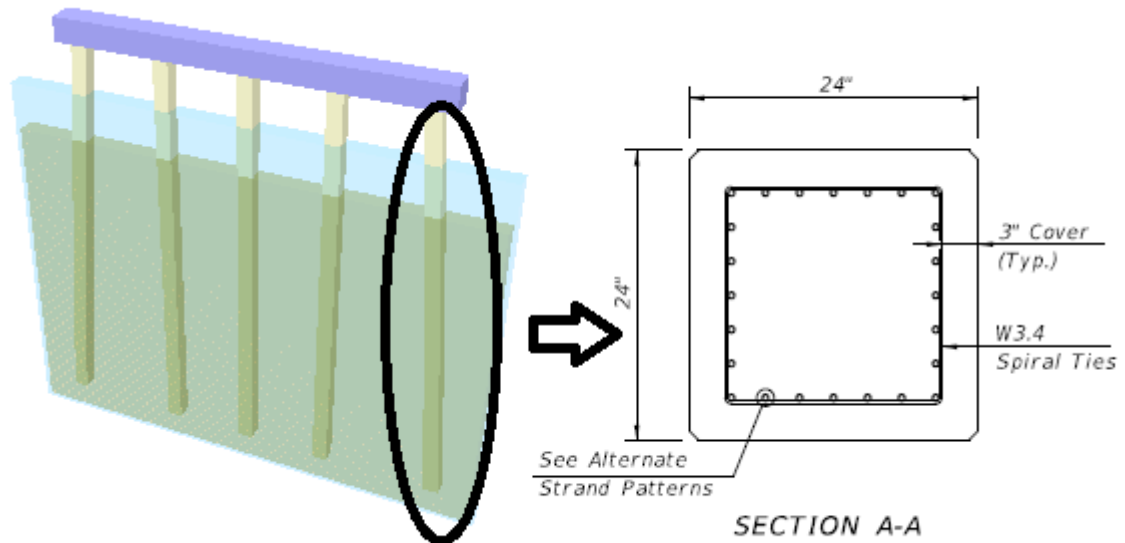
Standard 24" sq. FDOT prestressed pile section
